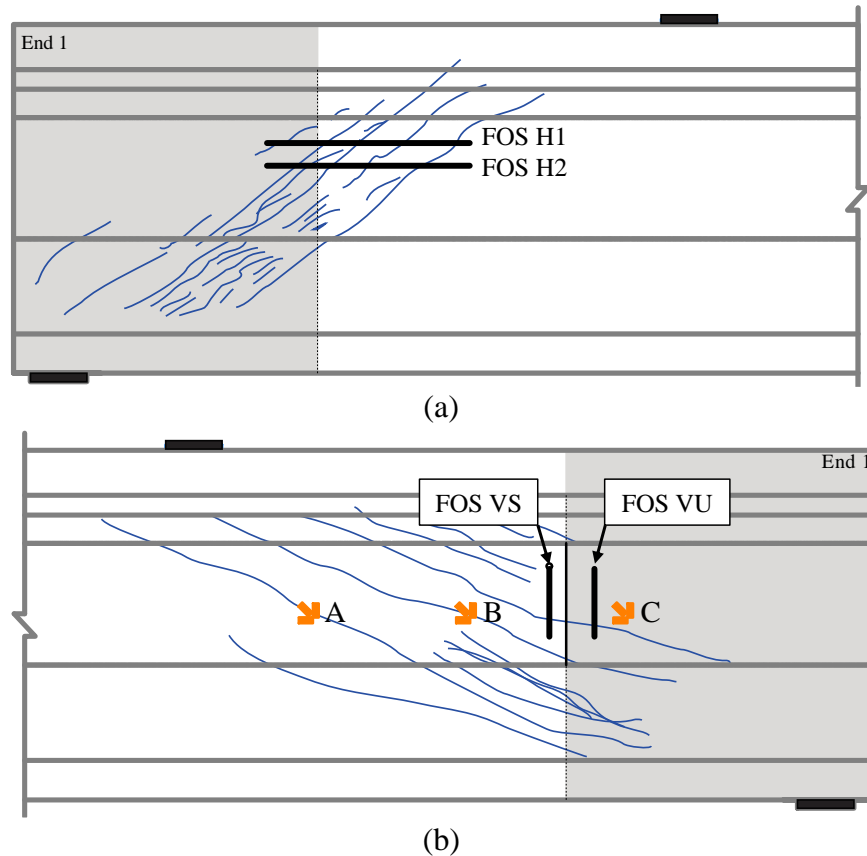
Crack patterns at final load on (a) front face and (b) back face
